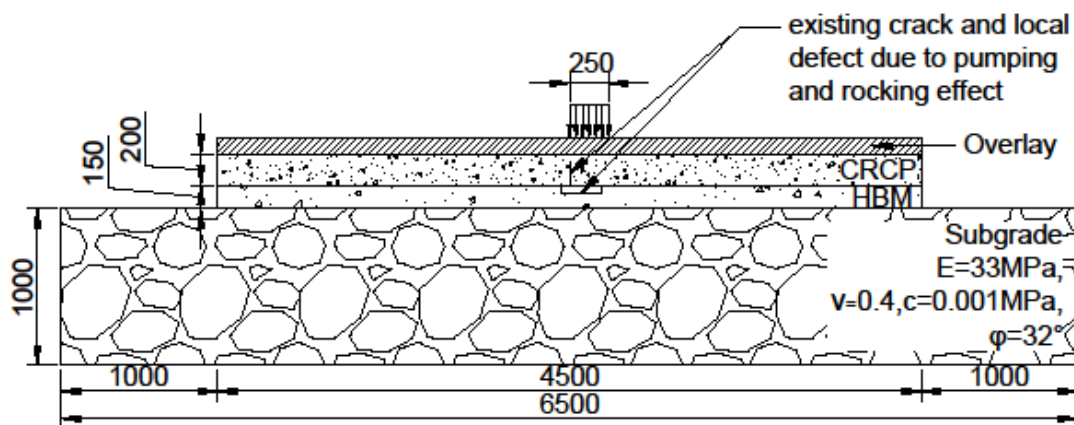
Diagram of a Concrete Pavement Structure. in FEA
